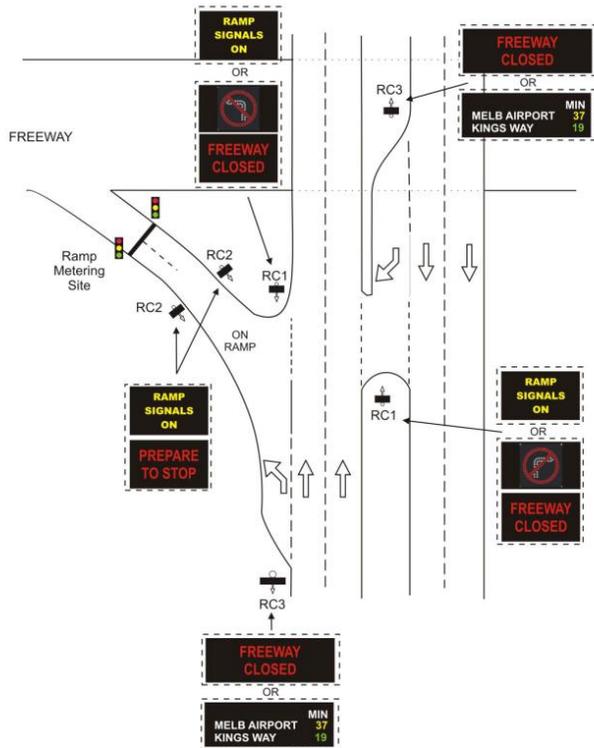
Typical Layout for RC1, RC2, and RC3 Signs, Arterial Road to Freeway
